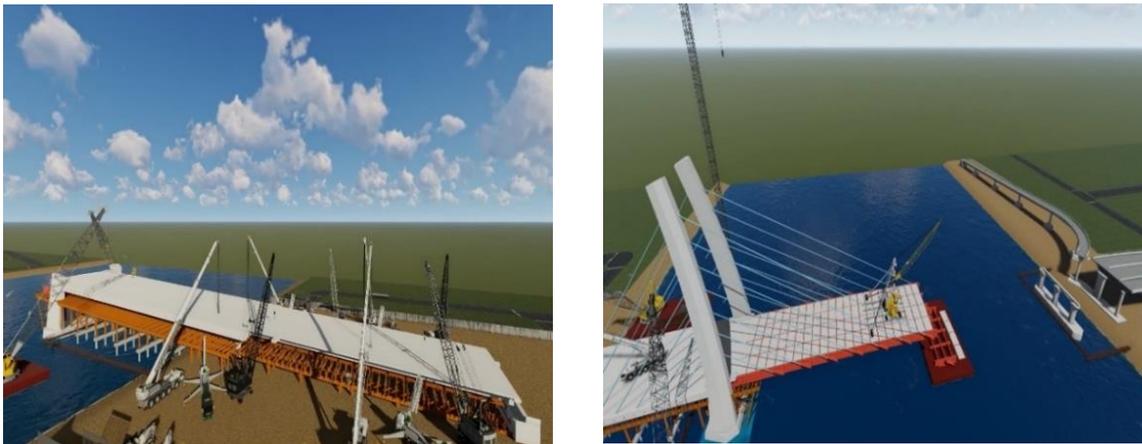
Construction model of the bridge deck, tower pillars, and cable-stayed stretch.
